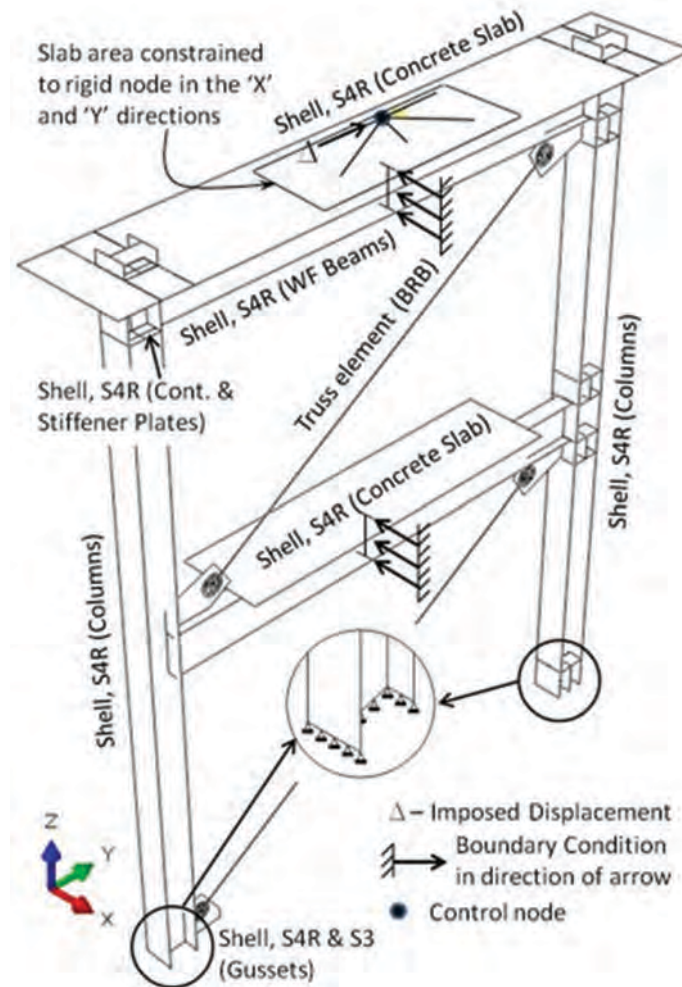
BRBF finite element model with element types and boundary conditions (see Figure 3b for component sizes and frame dimensions).
